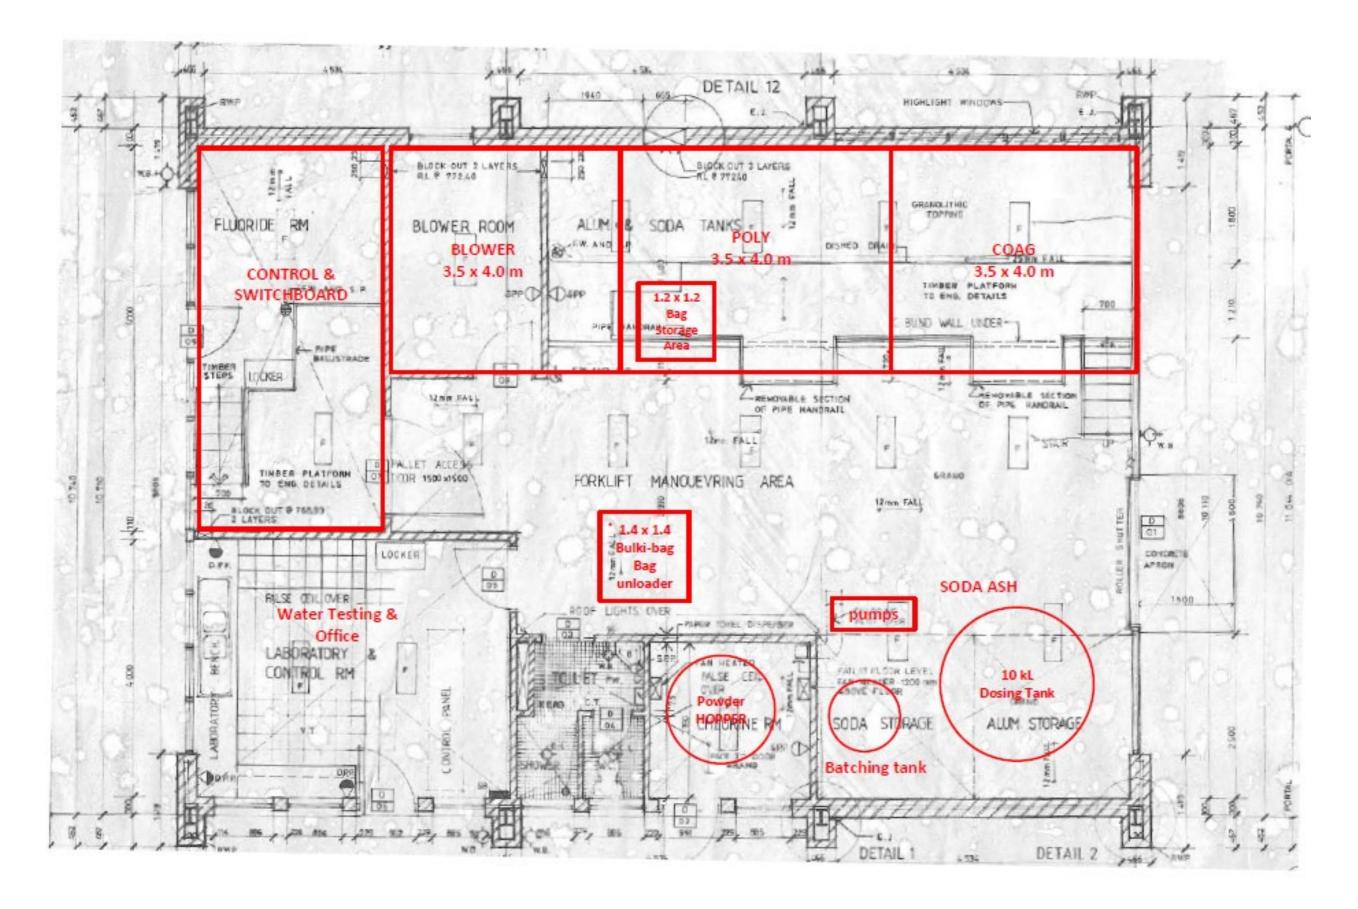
Bombala Control Building Layout for Option 1 (Upgrade existing plant)
